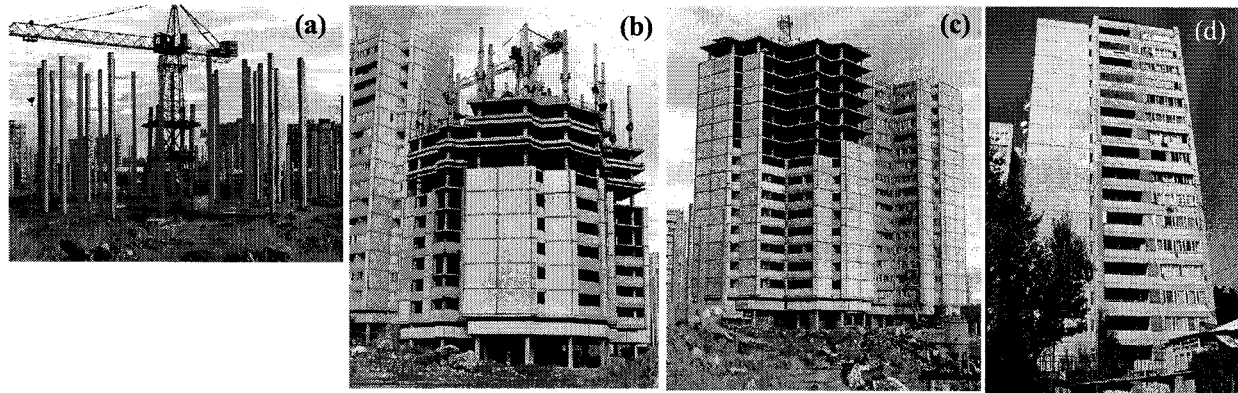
Construction of tall buildings with lift-slab method in Yerevan, Armenia, has kept stopping since 1991 (a). There is no wall on the ground level, and outer walls in upper floors are non-seismic (b), (c). Another RPC structure with 16 floors in Yerevan (d).
